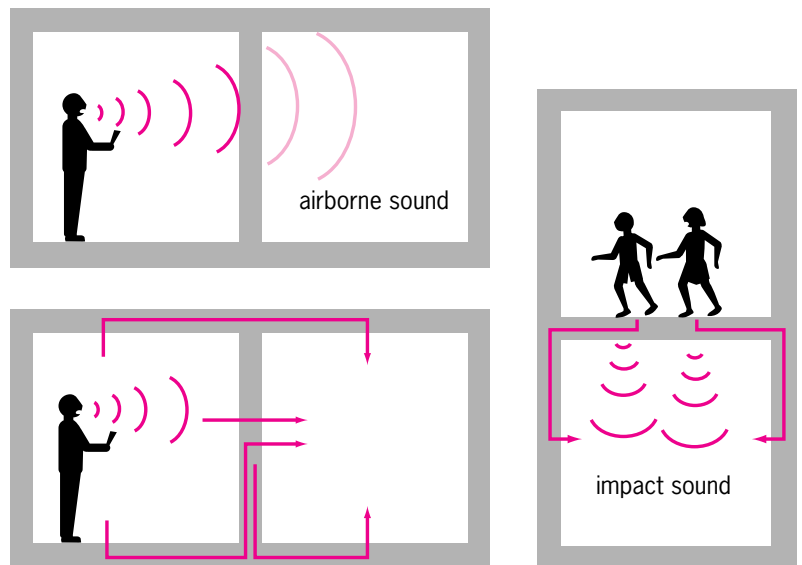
Sound transmission paths between adjacent rooms: direct sound paths through the wall and floor and flanking paths through the surrounding ceiling, wall and floor junctions
